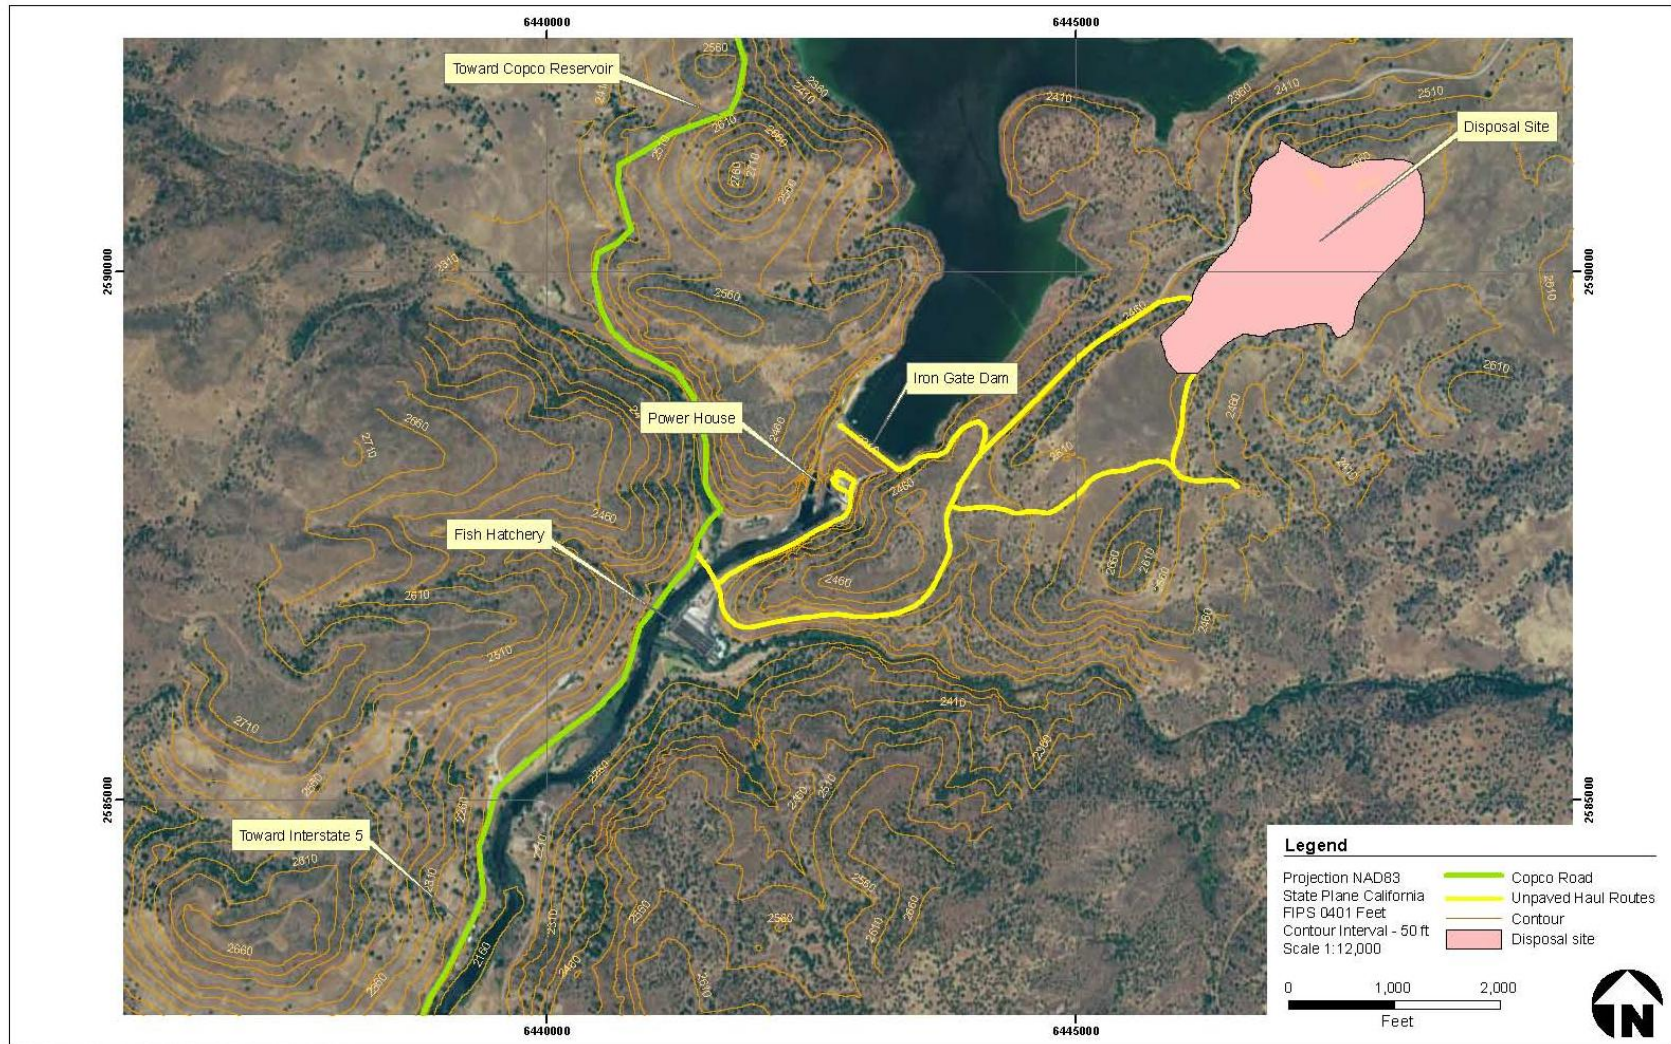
Iron Gate Haul Roads and Disposal Sites
